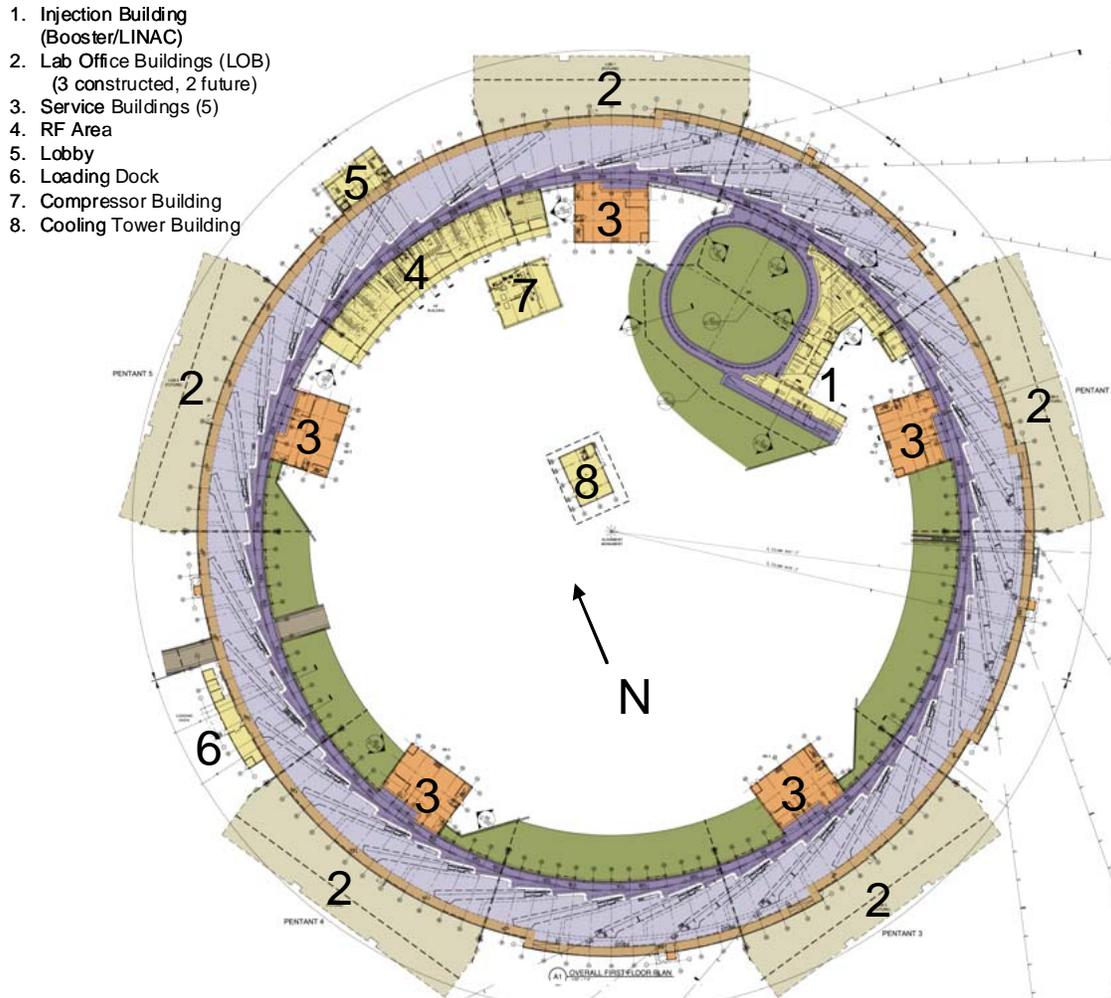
Site plan of NSLS-II building with projected locations for long beamlines; 1) Injection Building (Linac/Booster), 2) Lab Office Buildings (three constructed, two future), 3) Service Buildings (5), 4) RF Area, 5) Lobby, 6) Loading Dock, 7) Compressor Building, 8) Cooling Tower Building.
